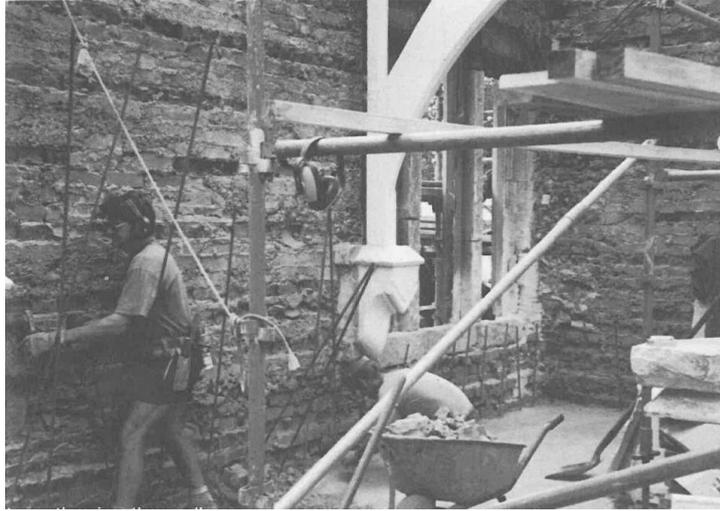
Interior stripped out and new ground floor installed prior to installation of reinforcement and sprayed concrete to the walls.
